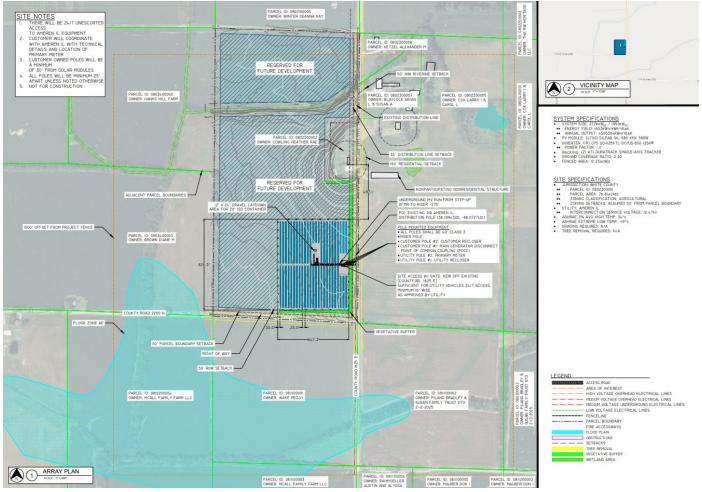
Pivot Energy IL 75 LLC Site Plan.
